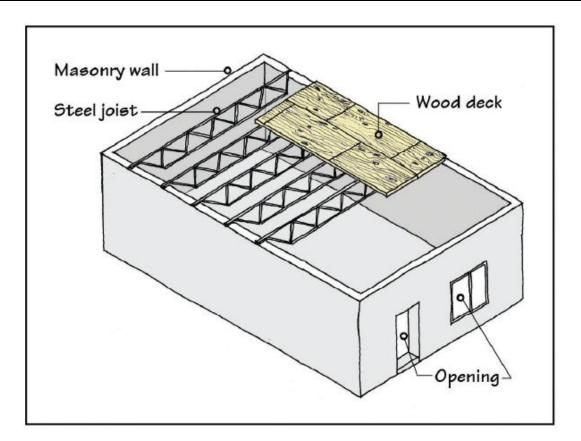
A simple Load bearing masonry wall building with steel roof joists and wood roof deck, used as an aid to recalling the sequence of the first few Divisions of the MasterFormat.
